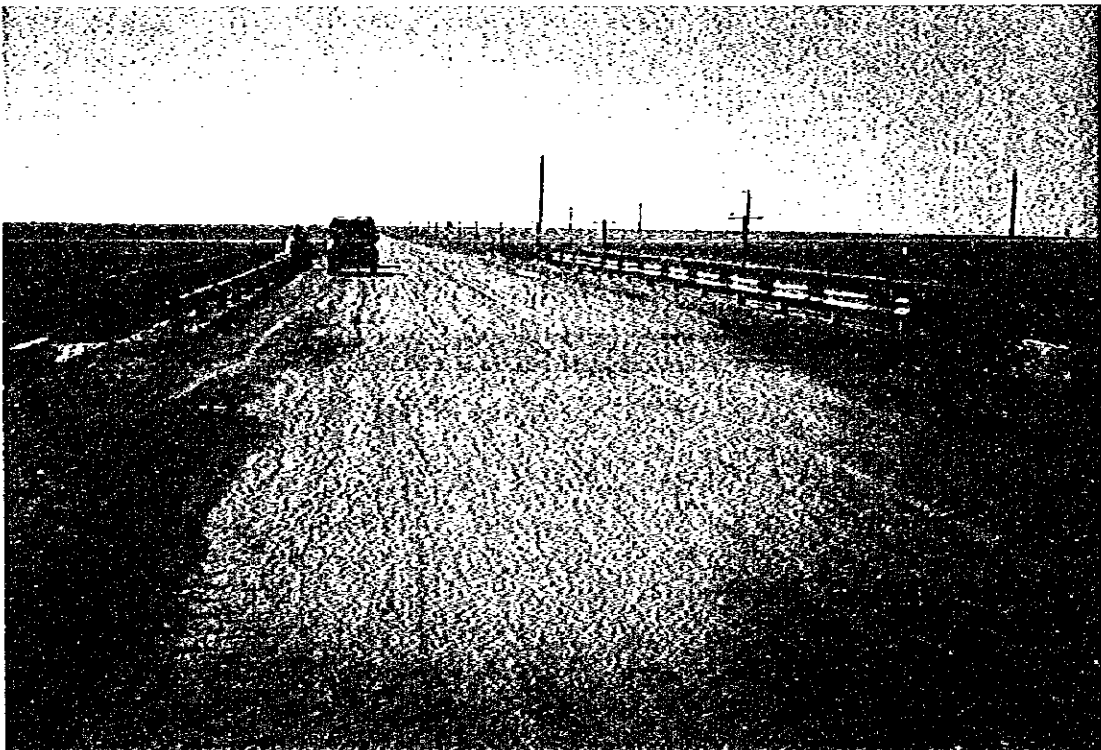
Republican Road and Bridge No. 4 (Atyrau to Mahambet)
